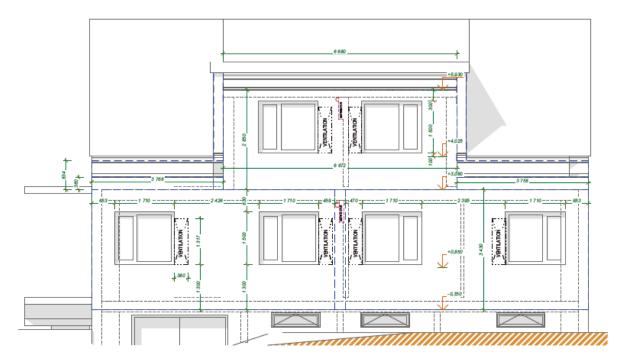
THE ACTUAL MODULATION OF THE FAÇADE, SOUTH ELEVATION
